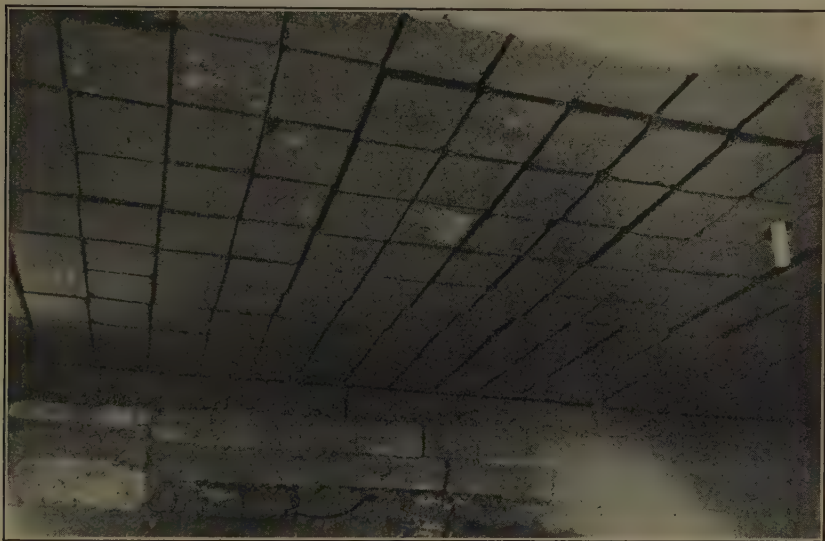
TEST ROOF AFTER THIRD RUN.
